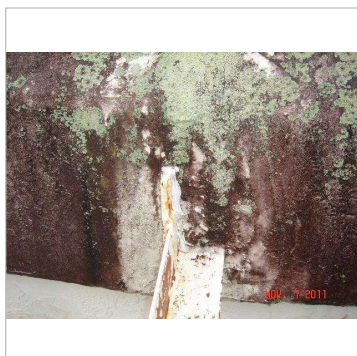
D - corrosion and stains on stucco walls at front right corner
